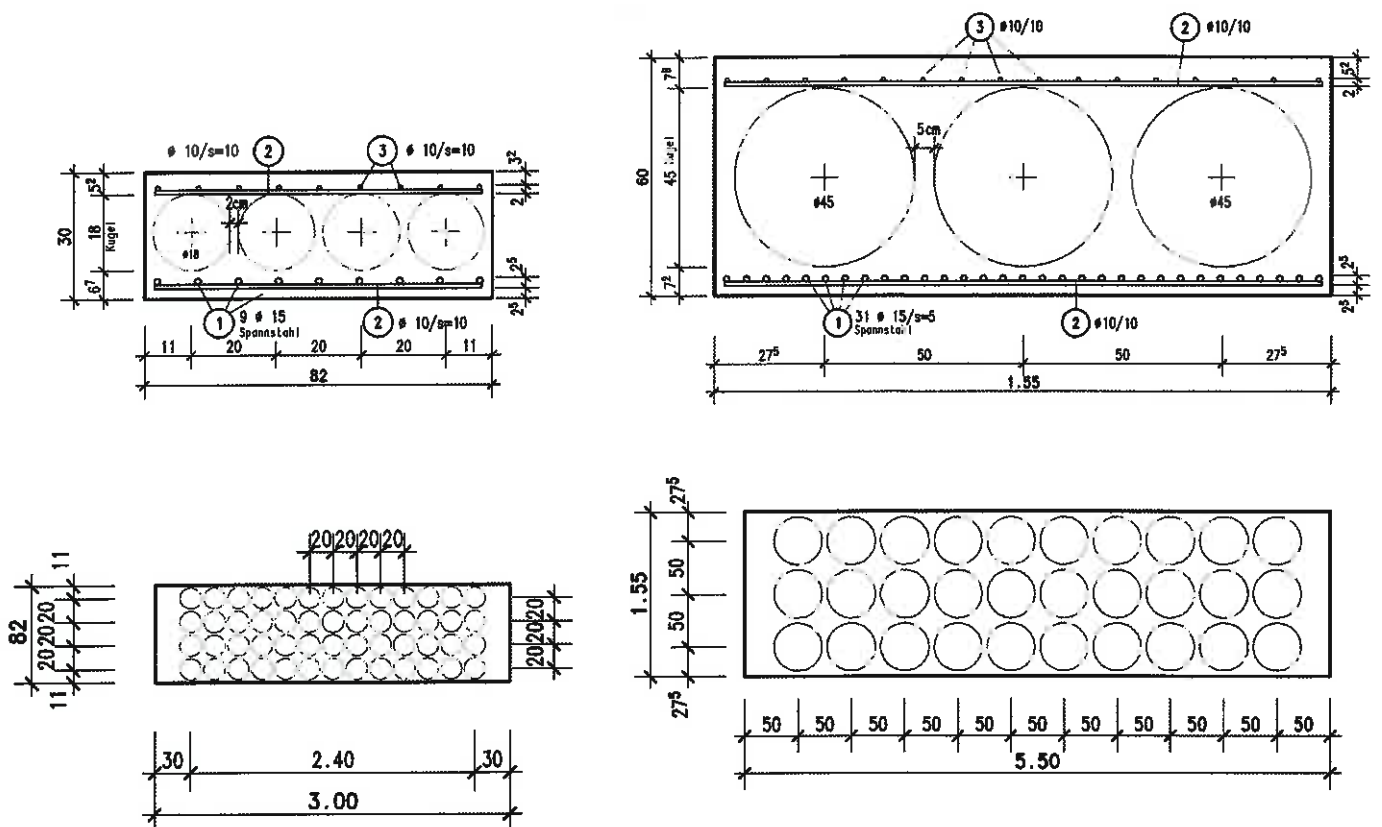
The cross-sectional dimensions and void former configuration in the Darmstadt tests [5]
